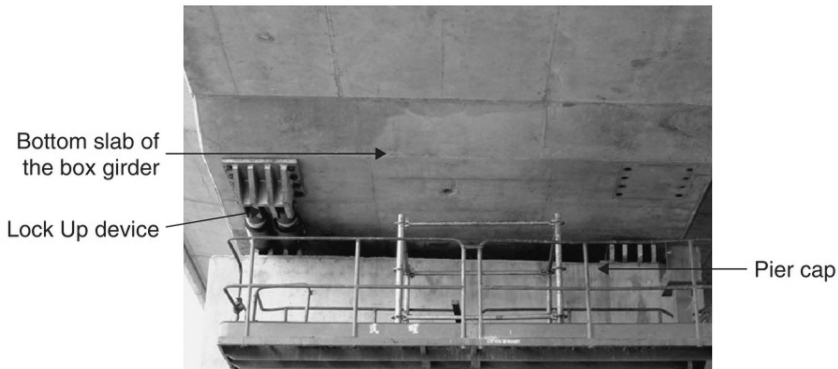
Lock Up Device located between the deck and the pier cap – Front view.
